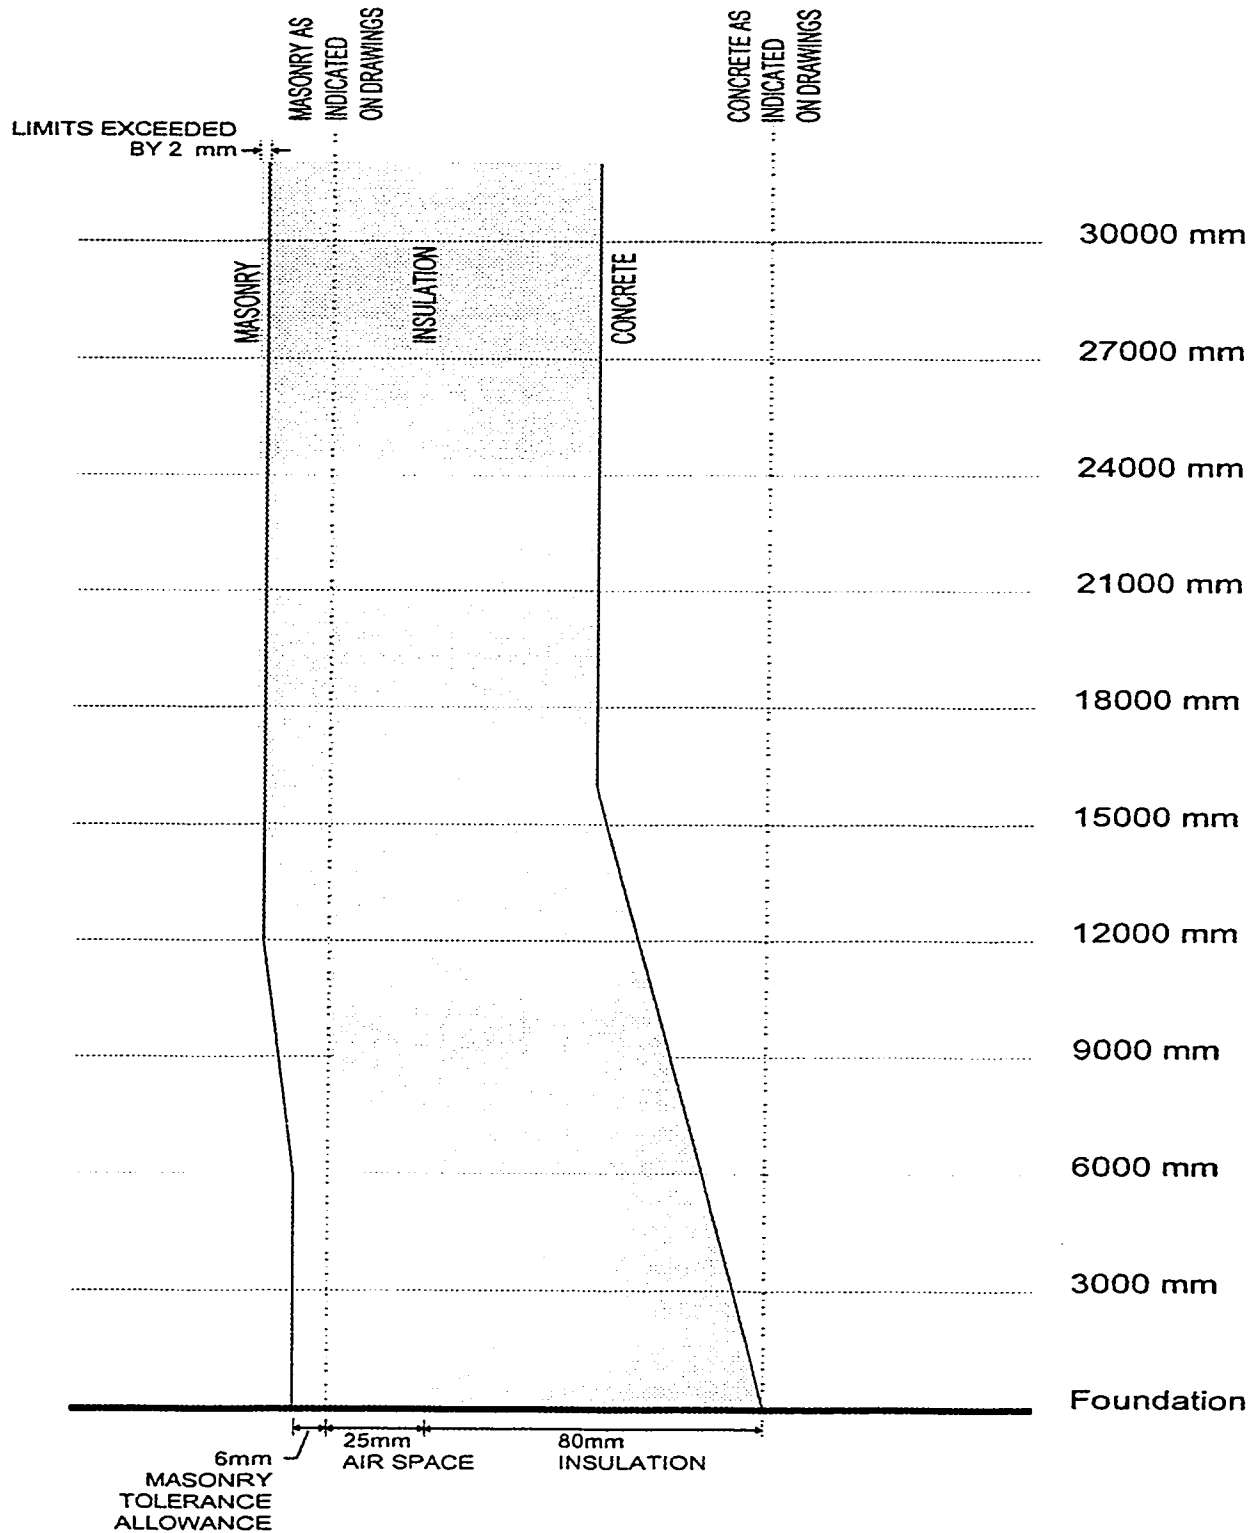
Masonry and concrete vertical tolerance example.
